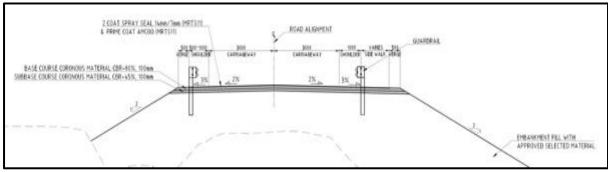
Typical Road Cross Section on the transition to bridge on Kolofe 1&2
